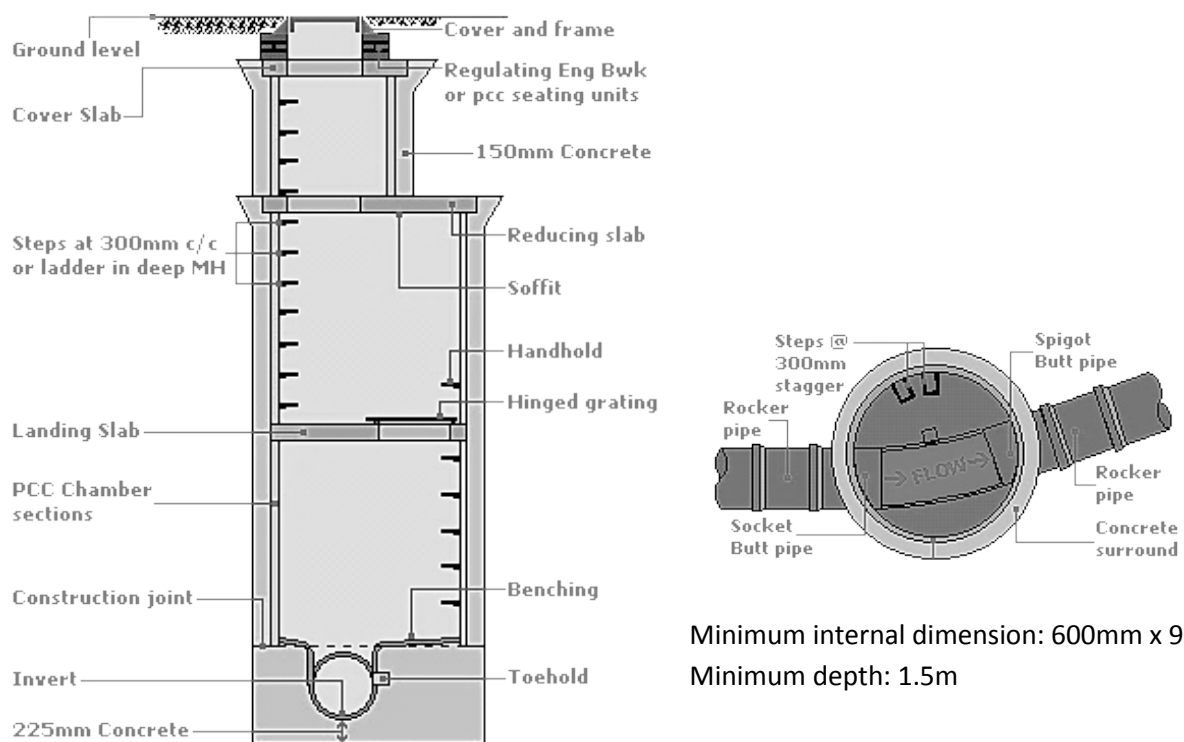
Cross-section and plan view of concrete inspection chamber. (Source: Paving Expert, 2014)
